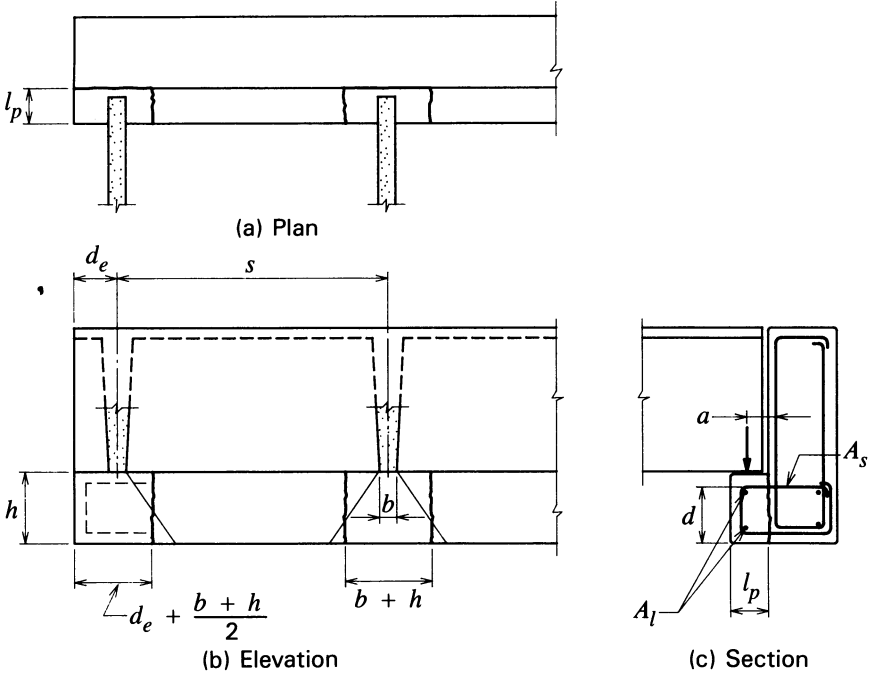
Typical ledger and ledge reinforcement based upon the recommendations of the Precast/Prestressed Concrete Institute.
